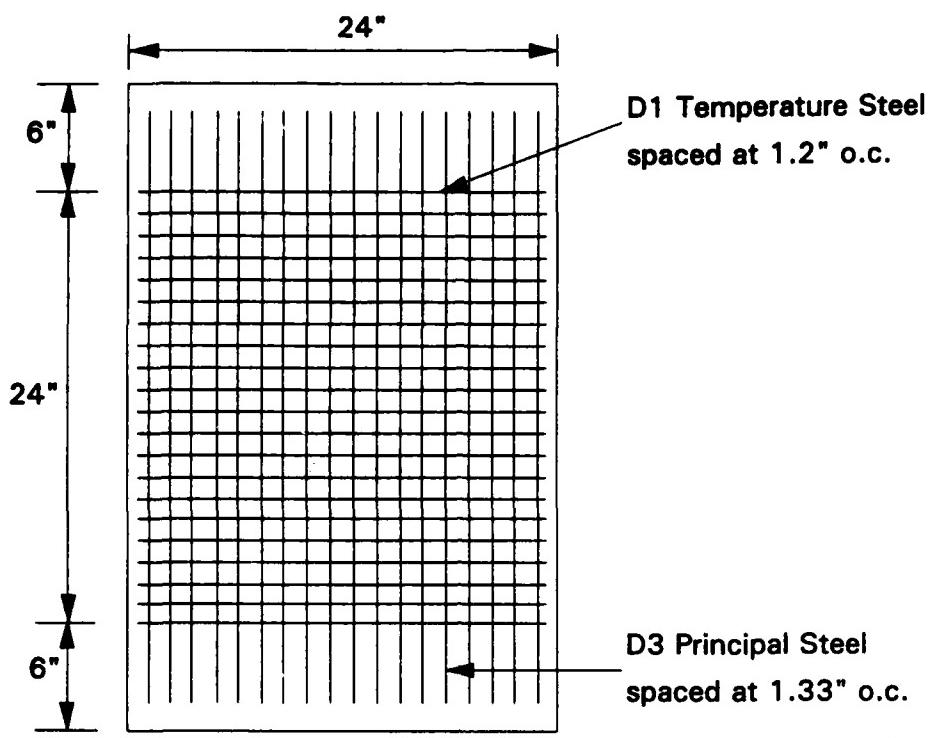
Plan View of Slab Nos. 3, 5, 9, 15, and 16
